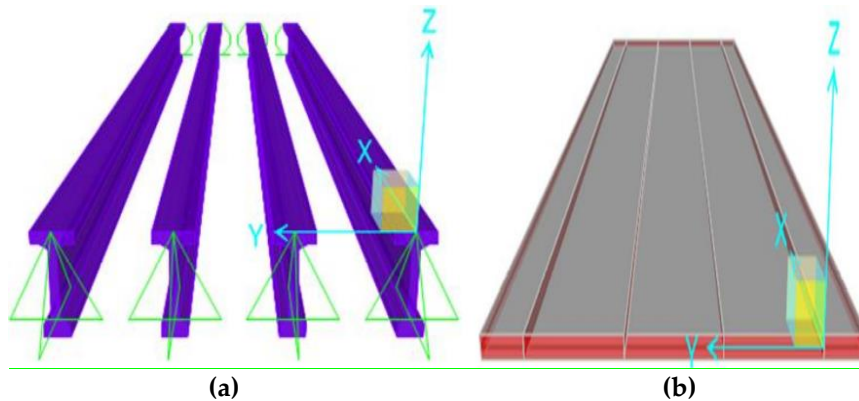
FEA model of Cisomang Underpass Bridge (front view): (a) Girder frame elements; (b) Girder concrete slab
